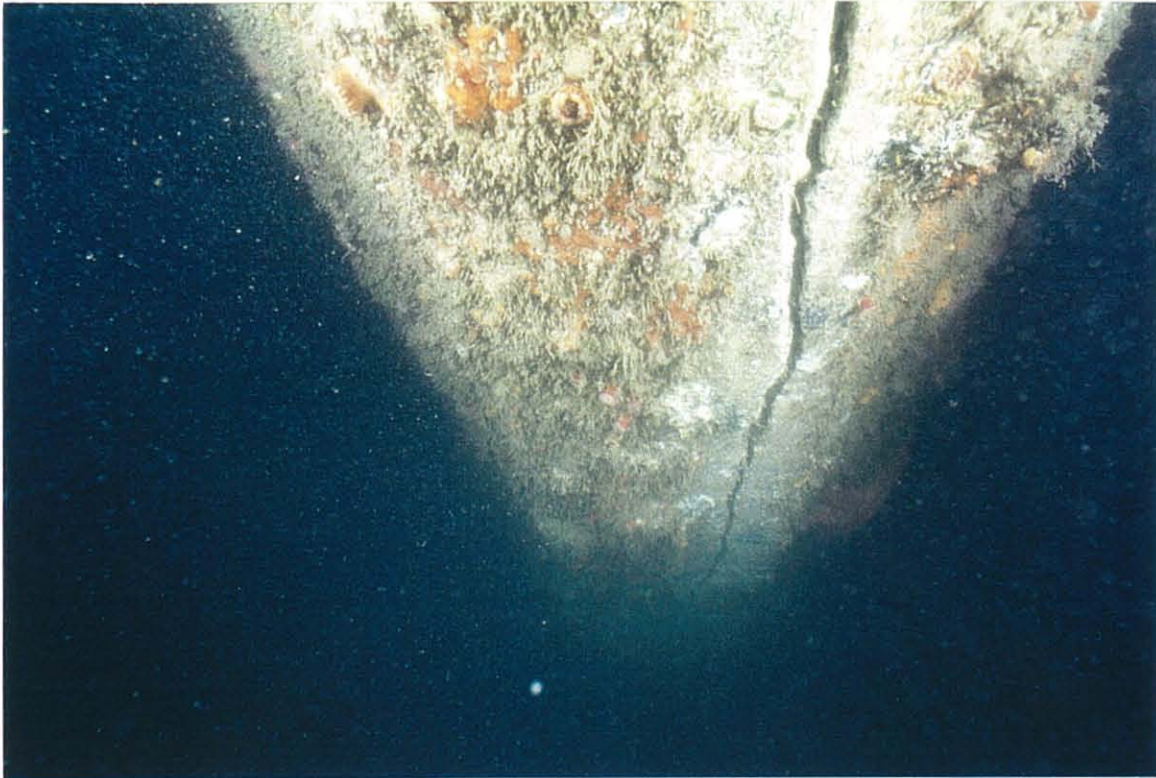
Vertical underwater crack on side of octagonal prestressed pile, near seabed (courtesy of U.S. Navy/Blaylock Engineering Group).
